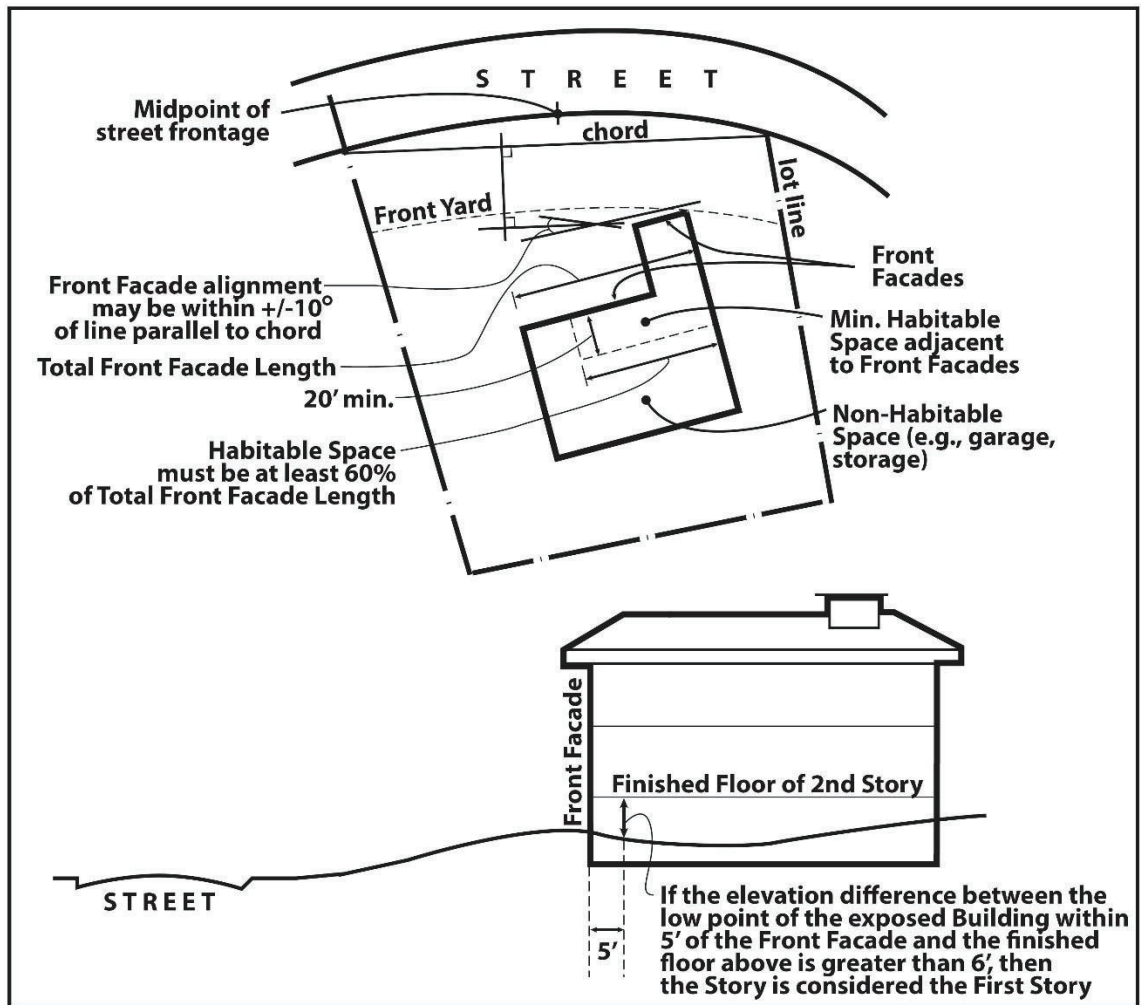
o.1: Siting Requirements and Definition of First Story
